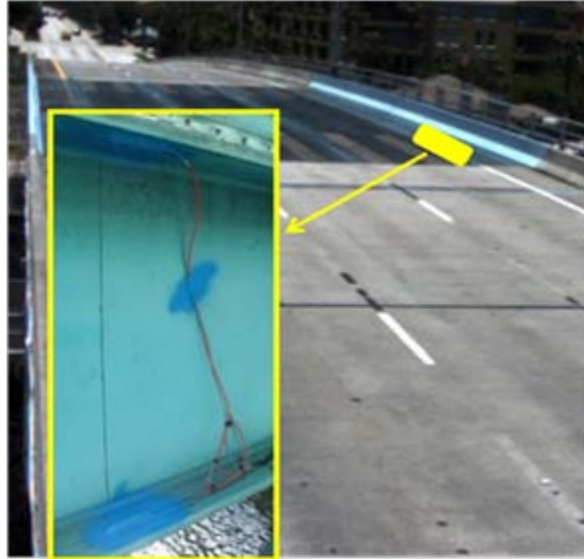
East North Main Girder Live Load Shoe Strain Gage Location
